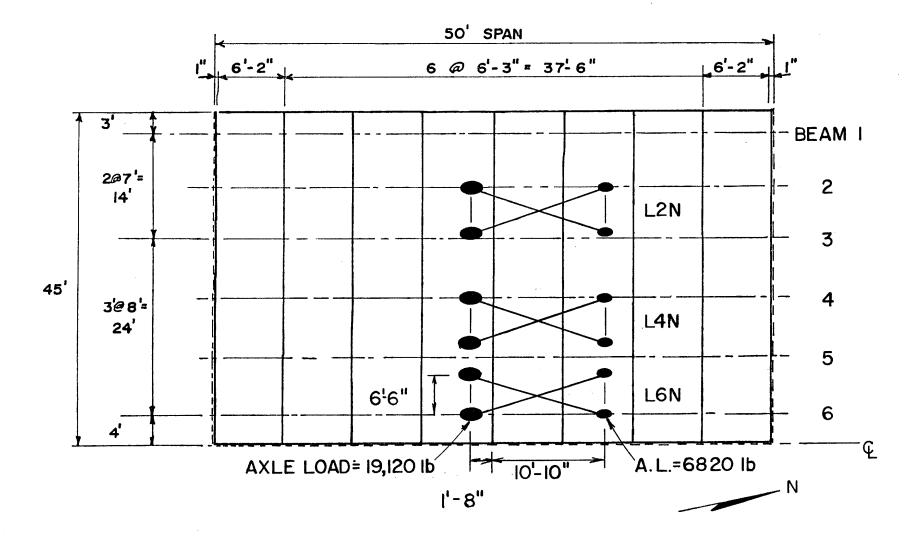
Position of Truck for Loadings L2N, L4N and L6N.
